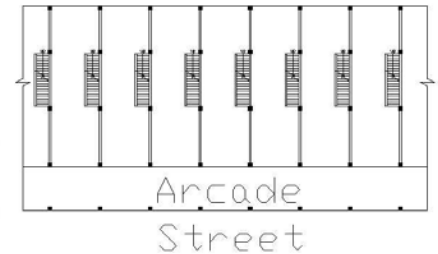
C: Typical Ground Floor Plan- Past Practice (Source: EERI 2001)
